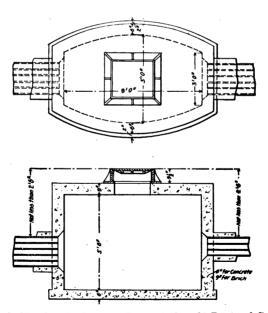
Vault Size 7 to be Used on Runs of 13 to 24 Ducts of Conduit when not Intersected.
